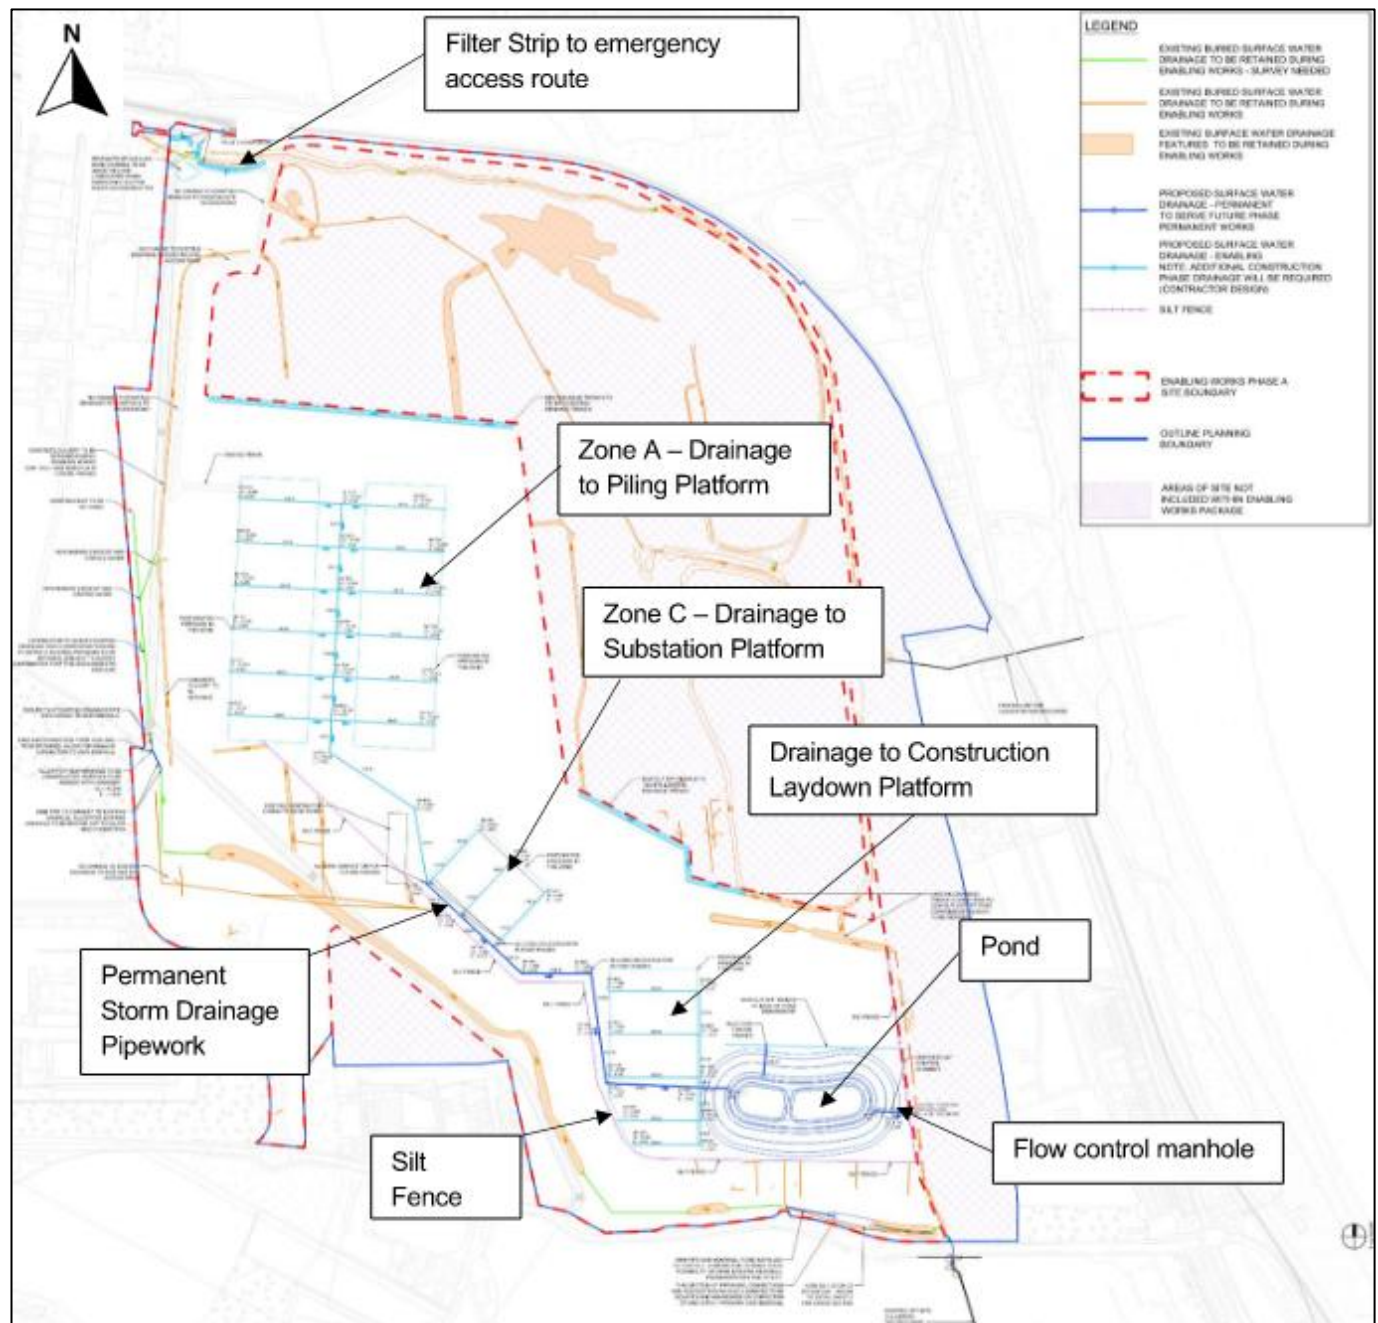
Phase A Enabling Works Drainage Layout (Reference 22)
